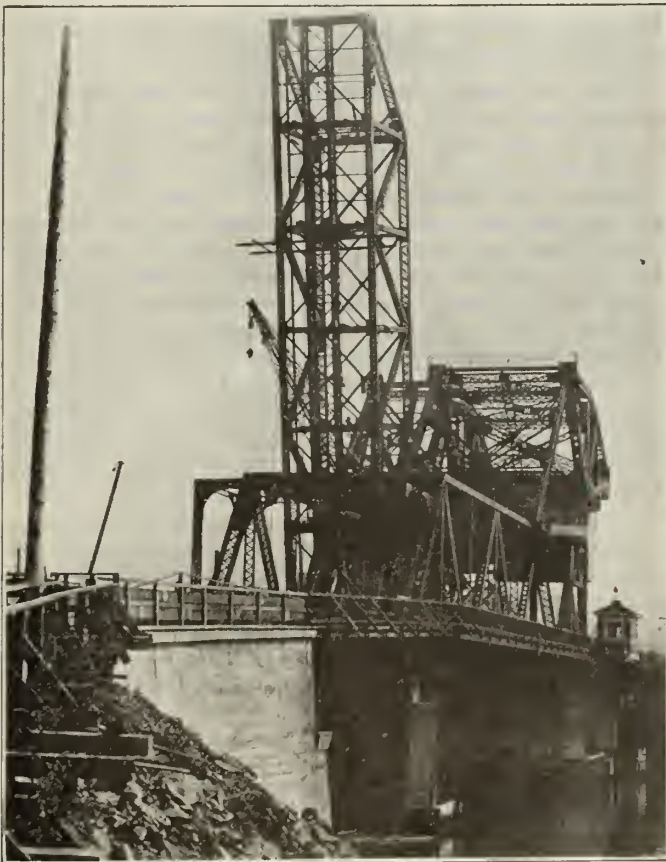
Highway Bridge Complete, Railway Bridge Under Construction
